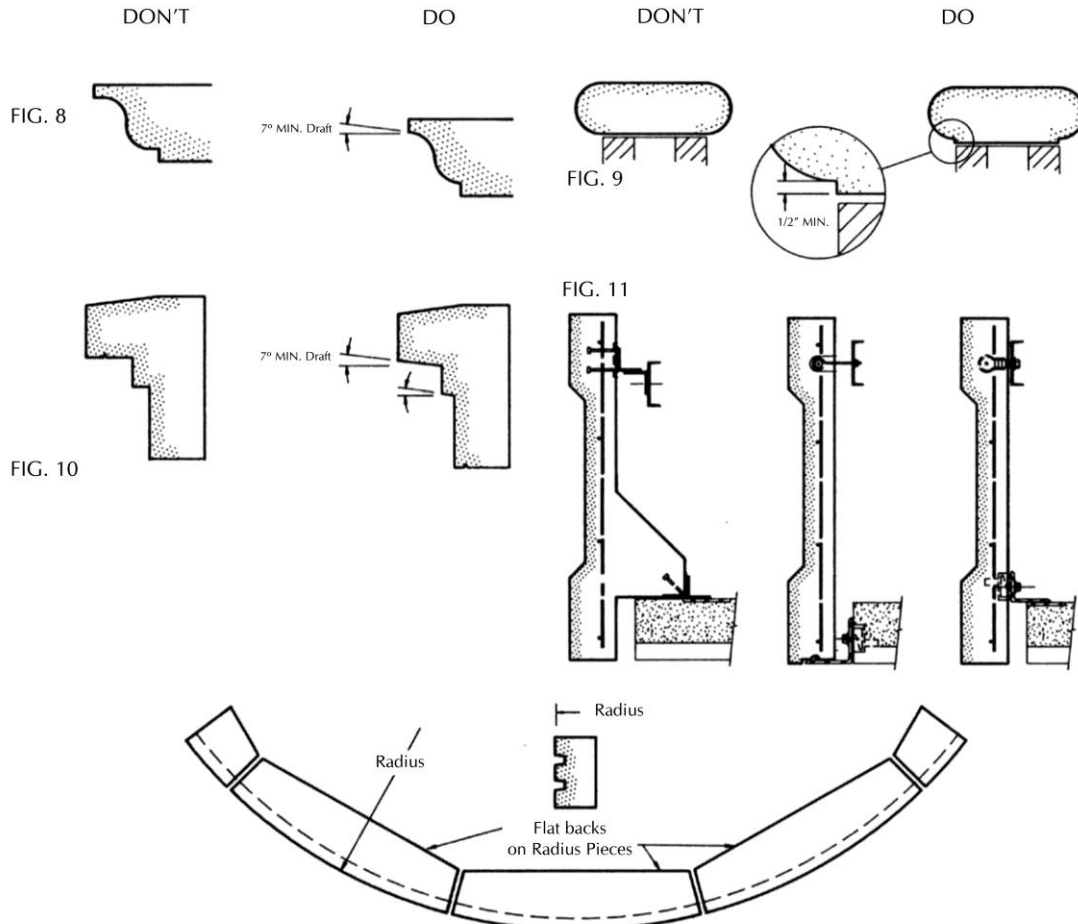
Projecting portions of sections, in general, should not exceed their thickness. A 7 to 9 degree draft is usually needed to separate the production pieces from the mould and may be provided by the manufacturer even where 90 degrees is shown on the drawings.
